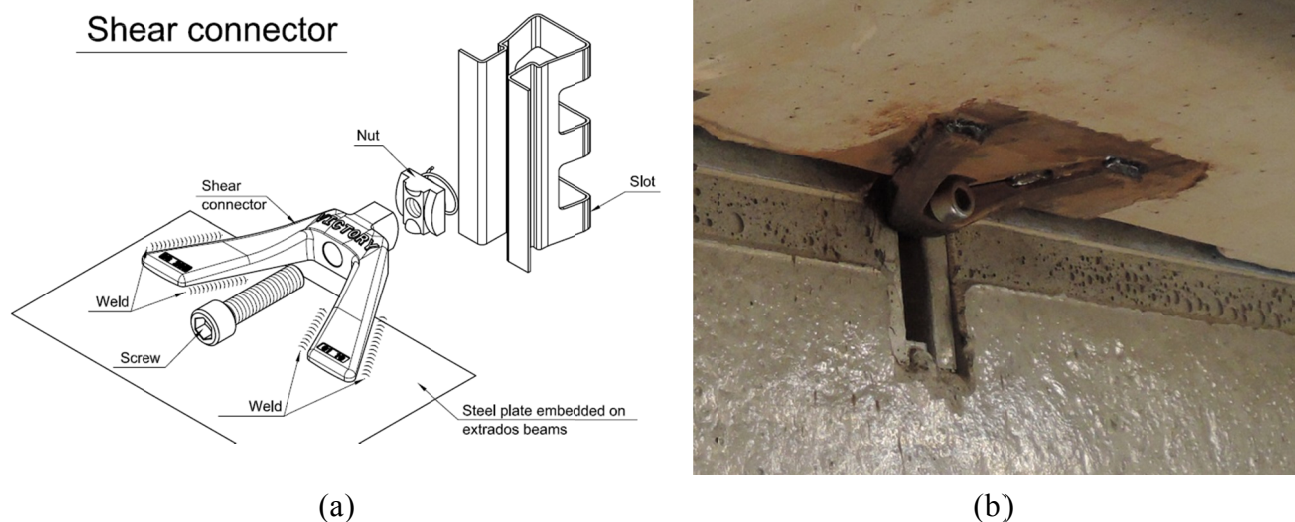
Shear connector: (a) drawing and (b) picture
